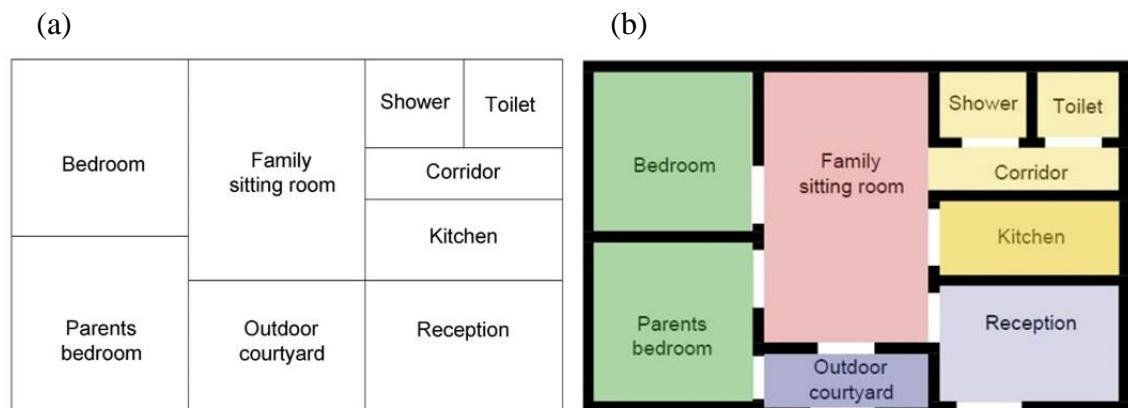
Azraq camp- Male group: a) Zoning of spaces, b) Plan with openings
